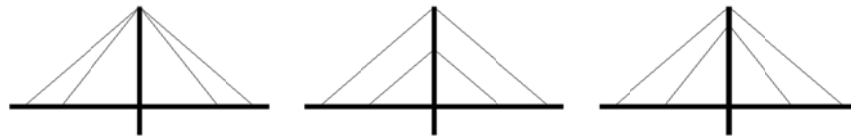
Configurations of the cables for cable-stayed bridges.
